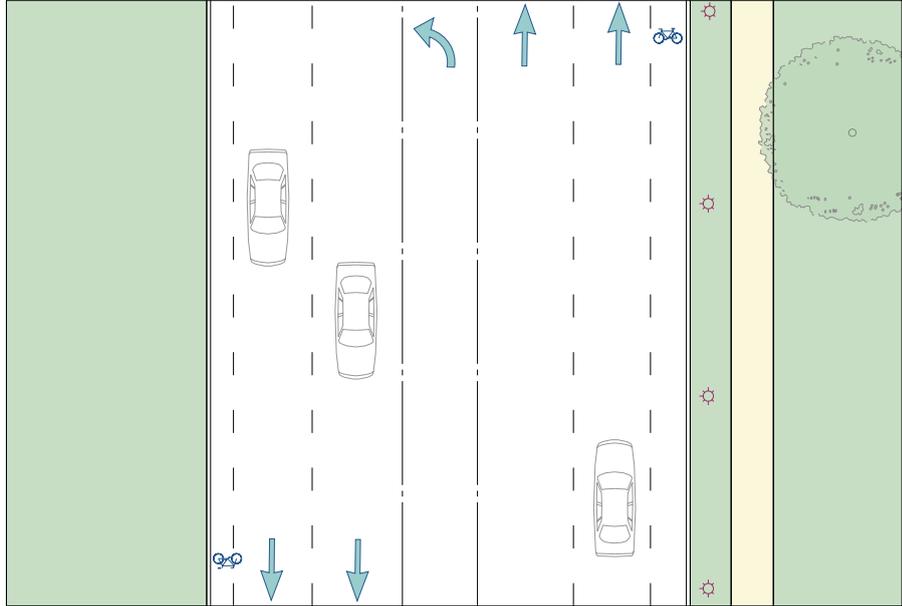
Existing University Avenue east of I-215/SR-60 plan diagram
